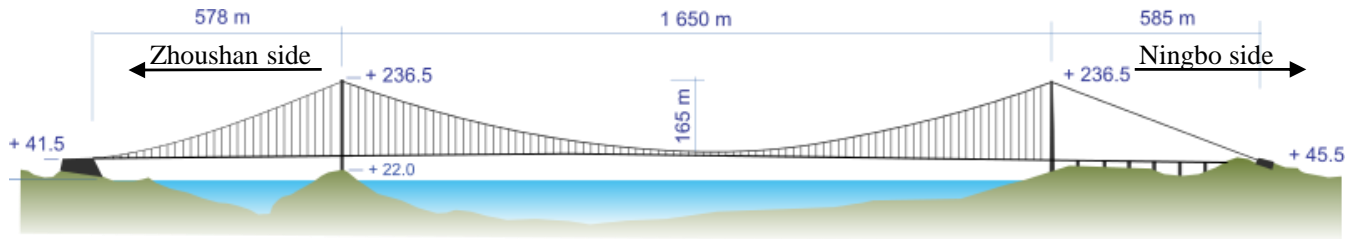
Layout of Xihoumen suspension Bridge (unit: m)
